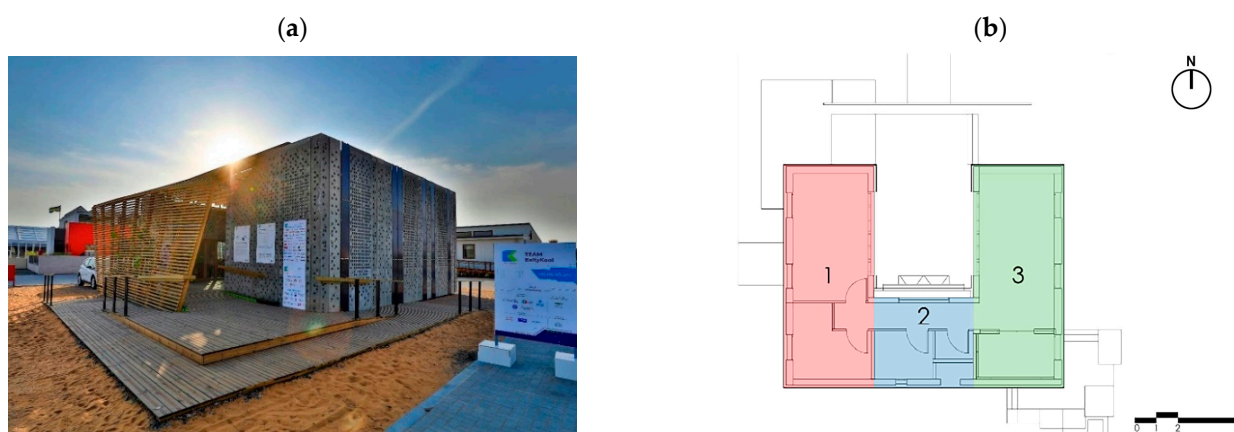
Team Baity Kool's house. (a) Exterior photo. (b) Floor plan—1: bedroom/office; 2: corridor, bathroom, technical room; 3: entrance, living-dining room/workspace, and kitchen. (Photo: SDME 2018 Organization. Floor plan: by authors based on team Baity Kool drawings).
